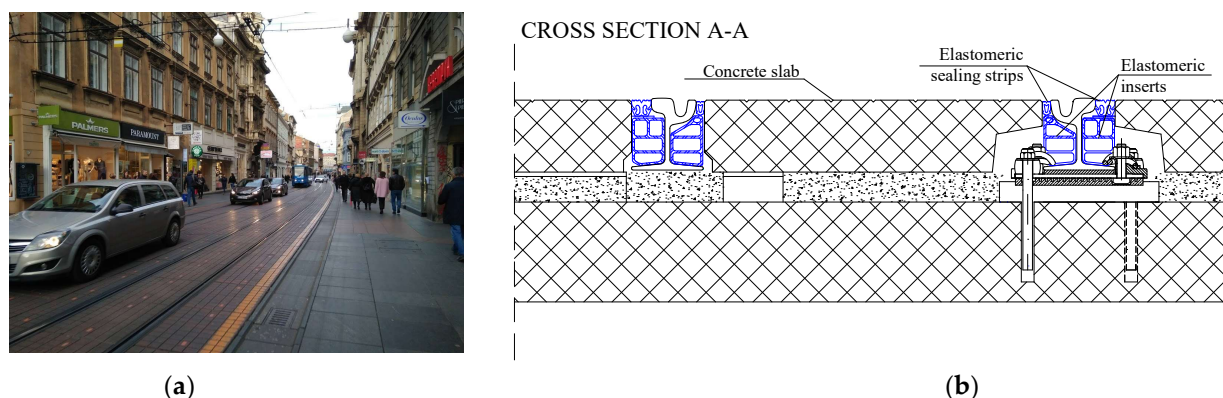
(a) Paved tram track structure in Zagreb, Croatia, built as part of the road surface cross section, as shown in (b).
